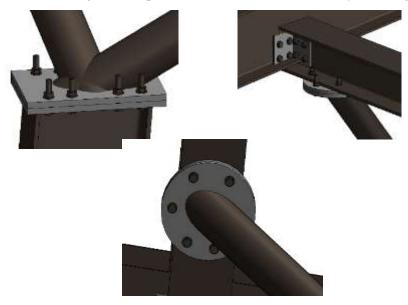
Presentation of few connection configurations of the pavilion extracted from Revit model.
